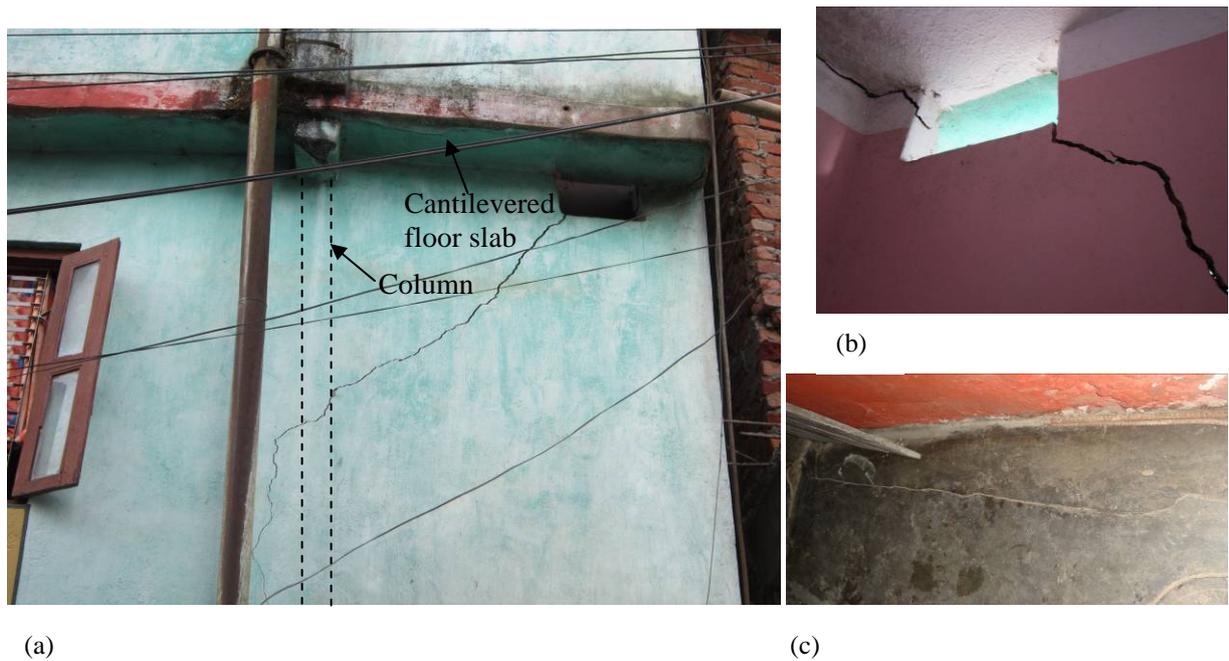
A damaged modern 3-story RC framed building with cantilevered floor slab and brick masonry infill walls: (a) with cracks in exterior; (b) with cracks in interior; and (c) cracks on the floor along the edge of underground water tank/ septic tank.
